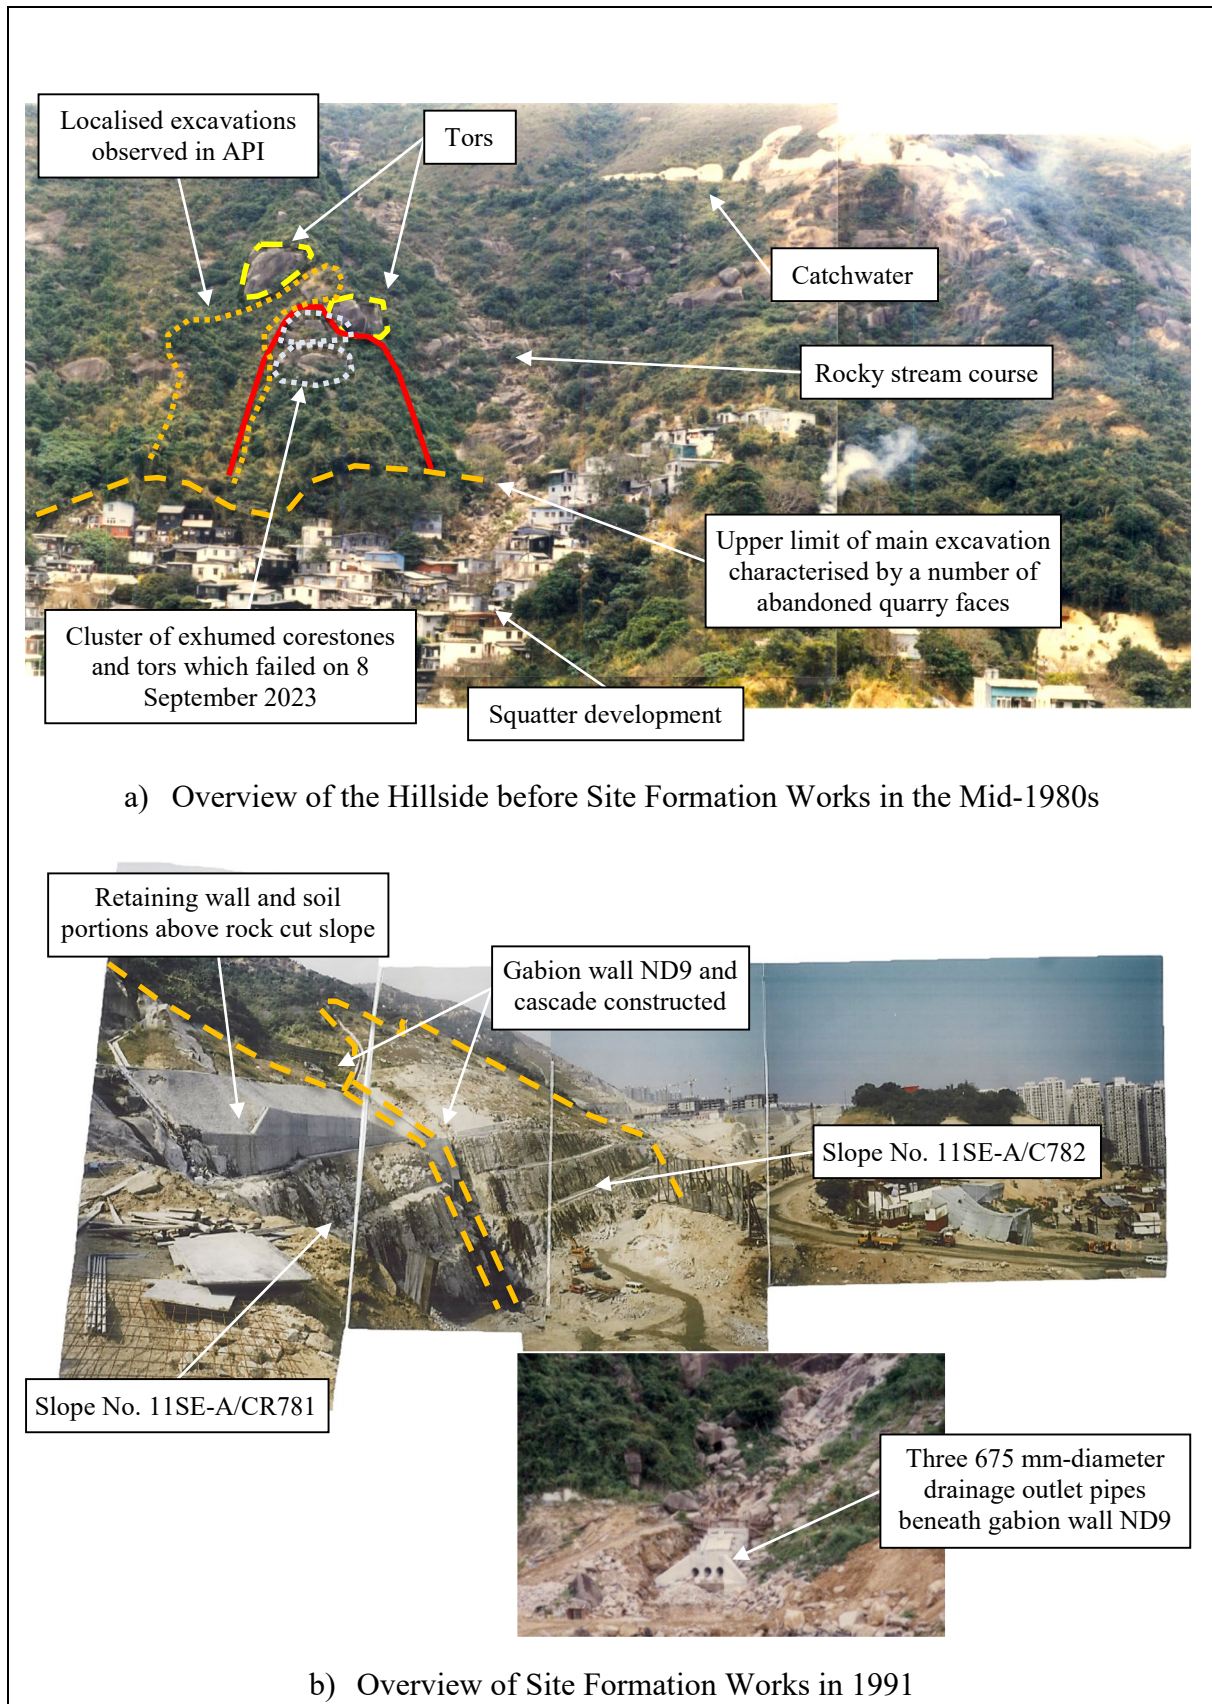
General View of the Landslide Site before and during Site Formation Works
